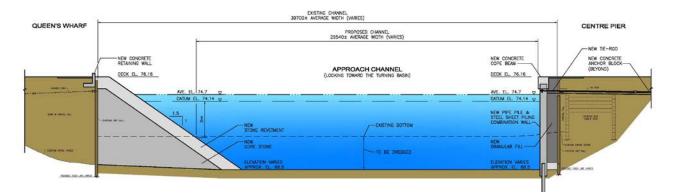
Typical section through Approach Channel following wall rehabilitation (looking north)
